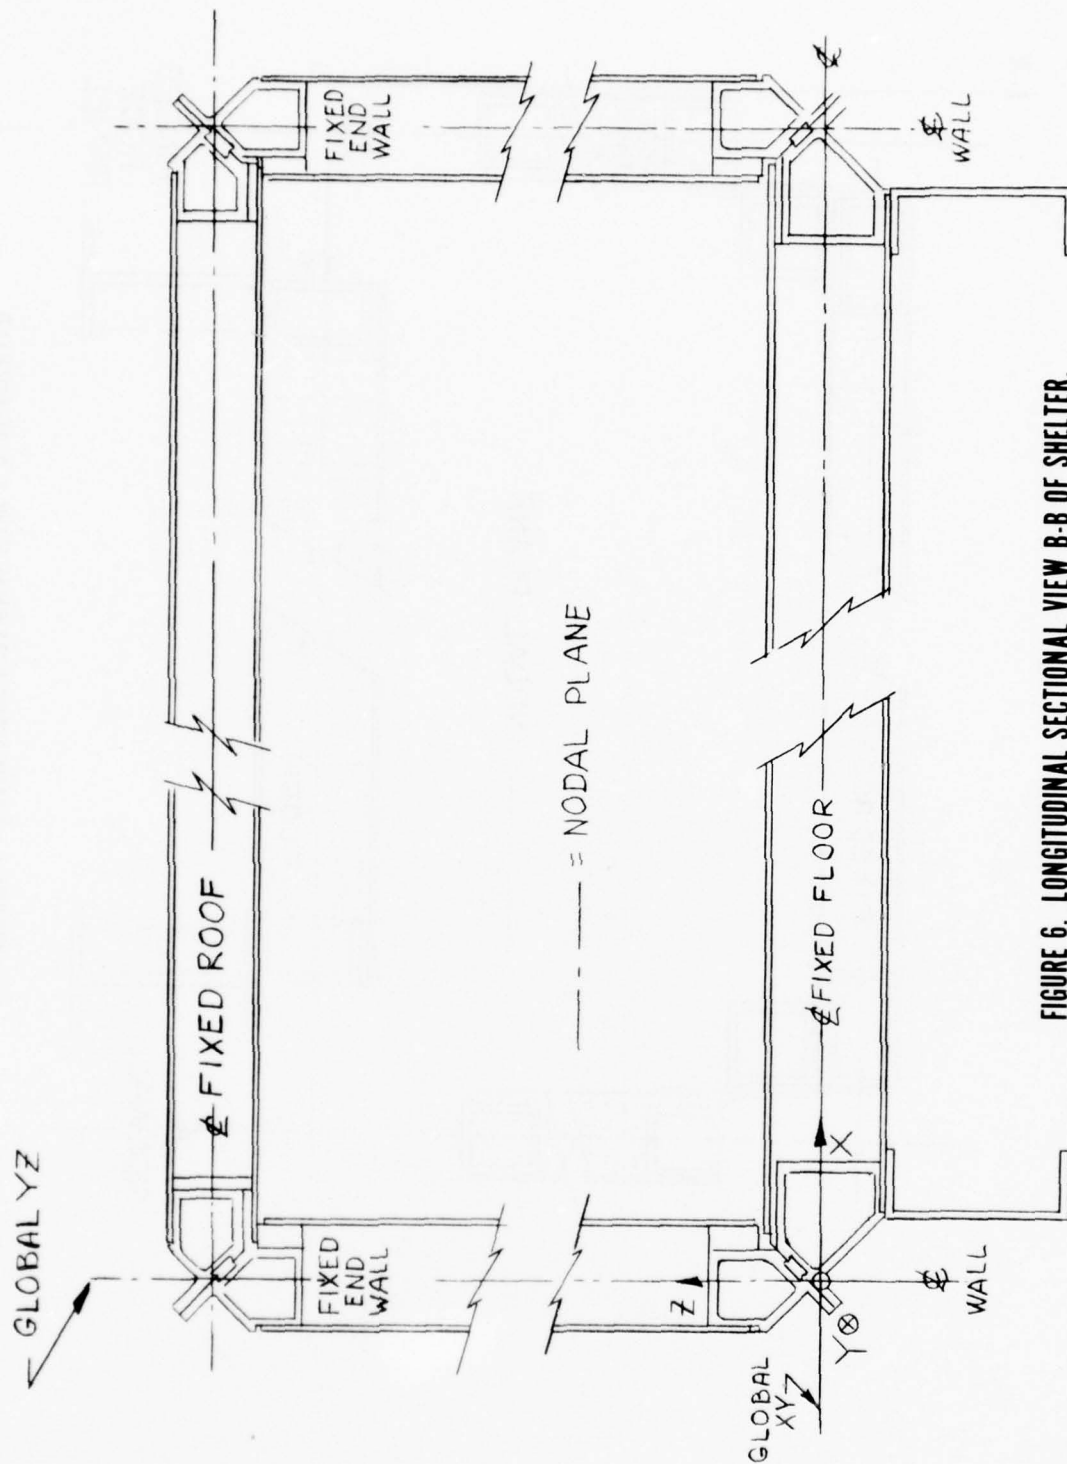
LONGITUDINAL SECTIONAL VIEW B-B OF SHELTER.
